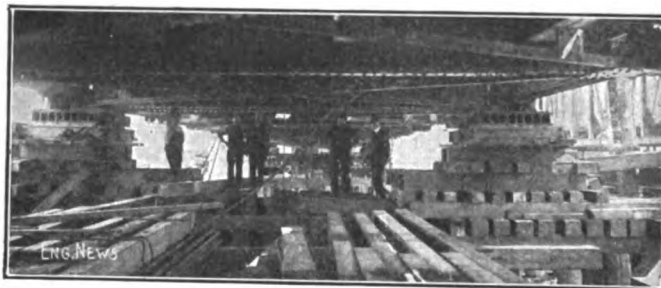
BRIDGE SUPPORTED ON BLOCKING AT ITS NEW ELEVATION AND READY TO BE MOVED
